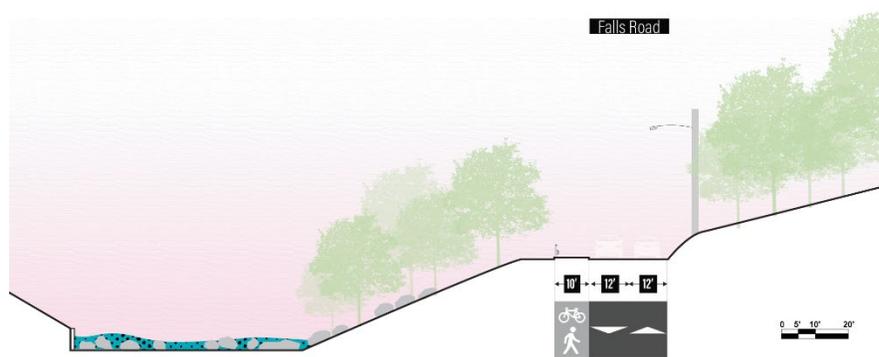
Section 3i Conditions along Falls Road north of the Potts & Callahan yards. The road climbs steeply here.
